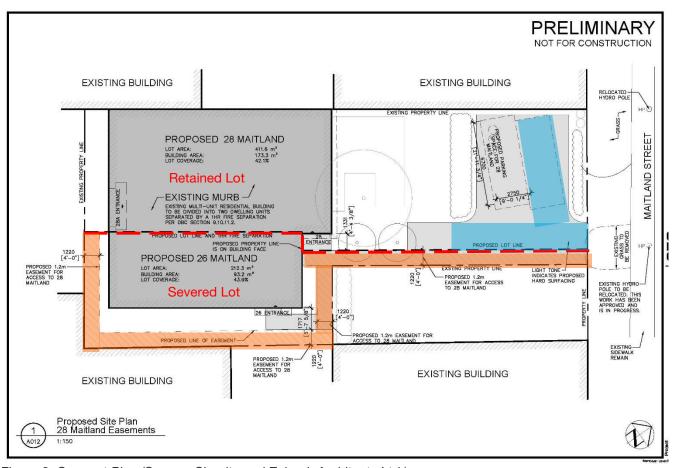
Concept Plan (Source: Shoalts and Zaback Architects Ltd.)
